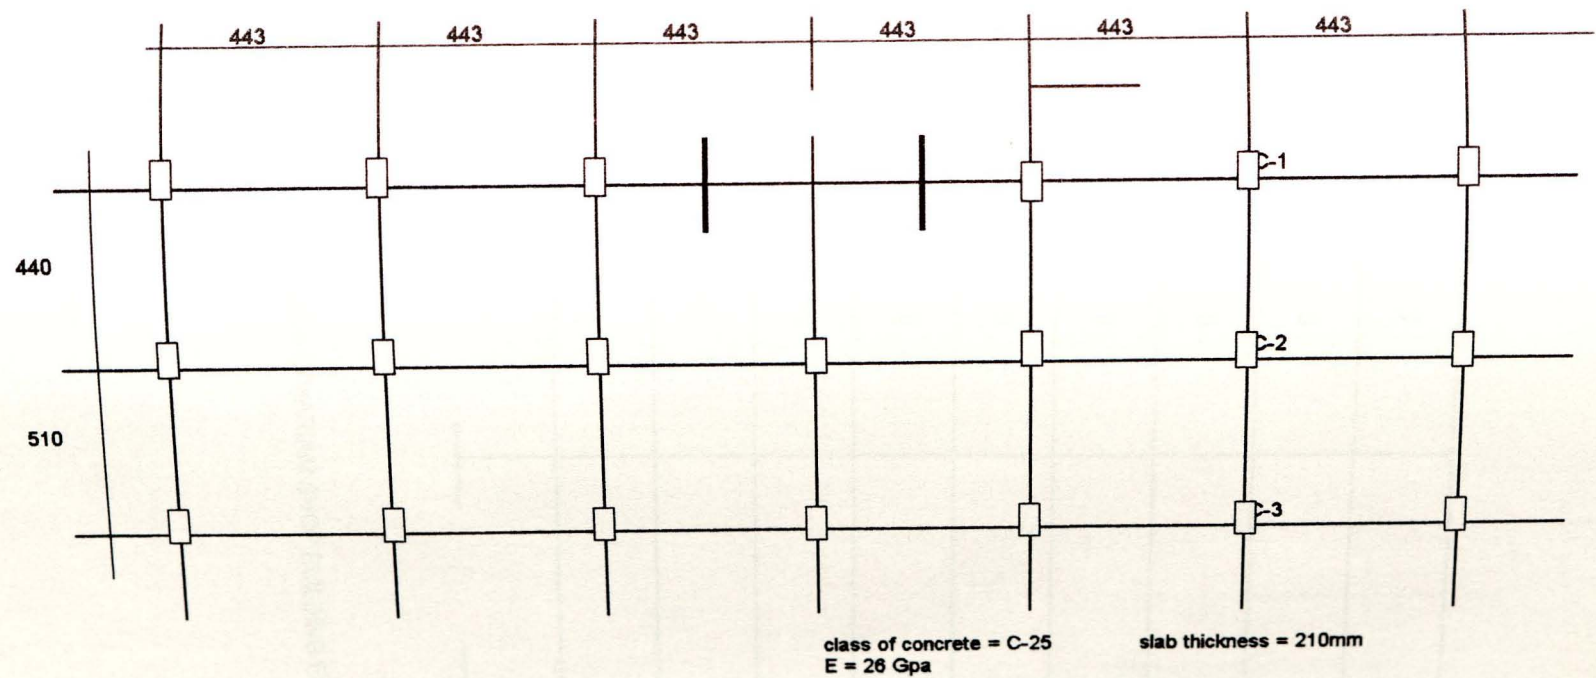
ATO MERGIA G/MARIAM SHOP BUILDING FLOOR PLAN.
